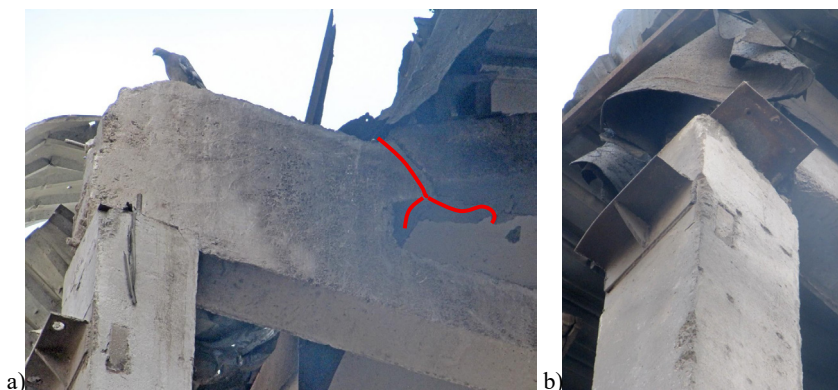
(a-b) – Formation of transverse vertical cracks in the cross-section of the upper crane part of the column
